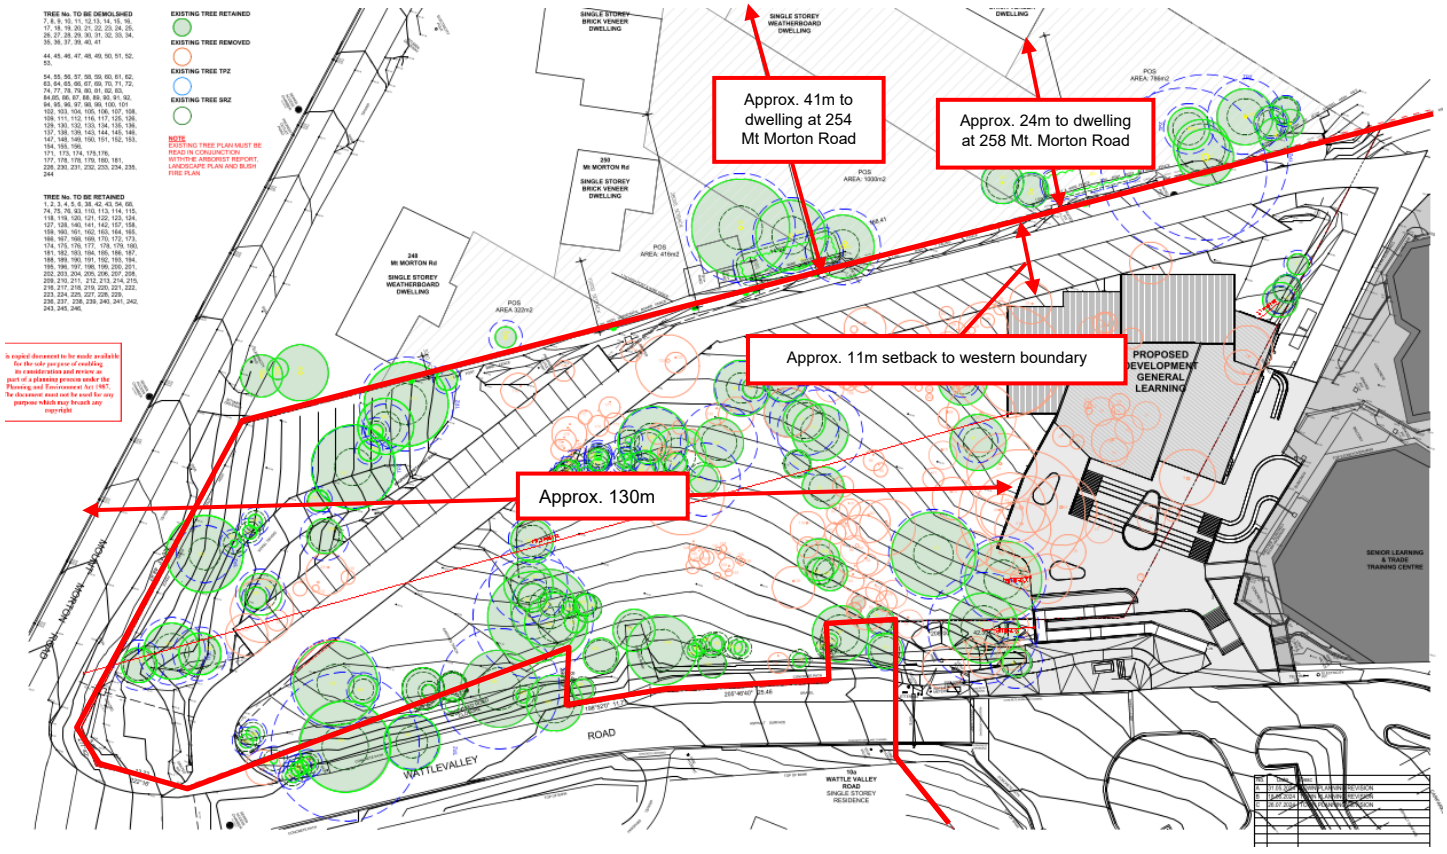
Extract of the siting plan showing the proposed building relative to the boundary, Mount Morton Road frontage and adjoining dwellings
